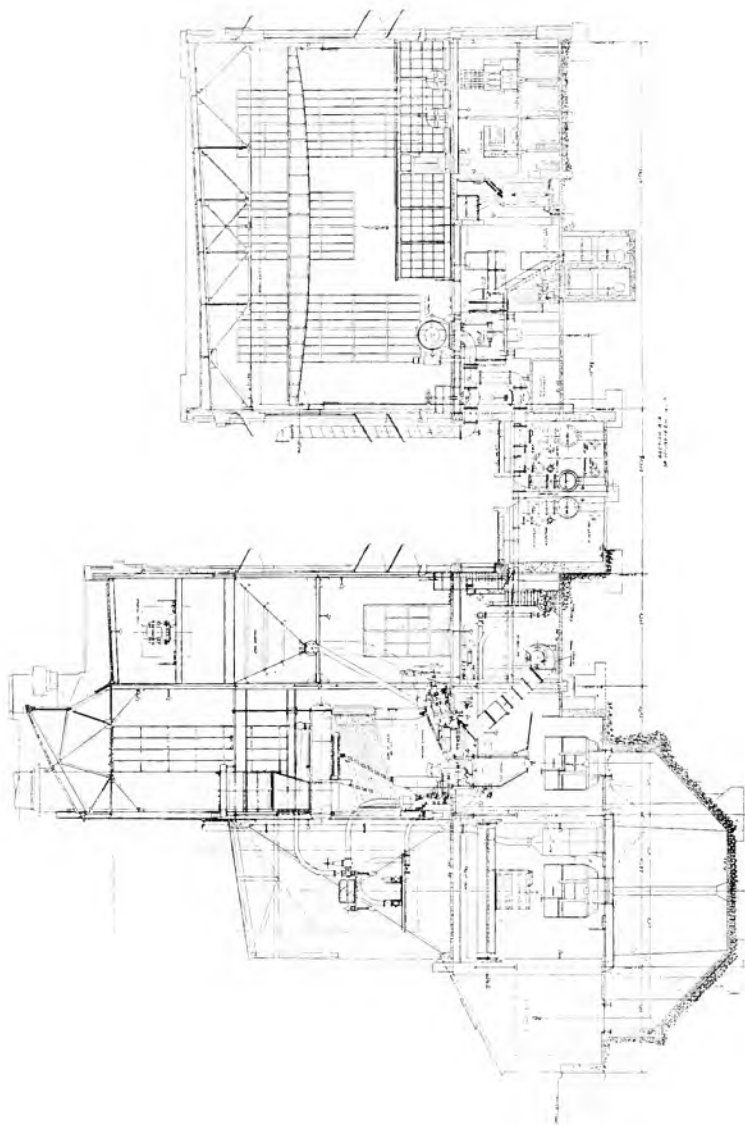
Erie Works Central Power Plant Section, showing Taylor Stoker
